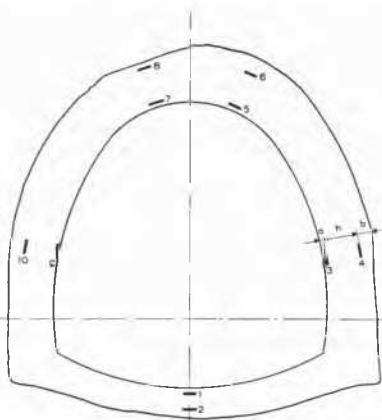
Location of measuring elements in concrete lining of pit bottom.
